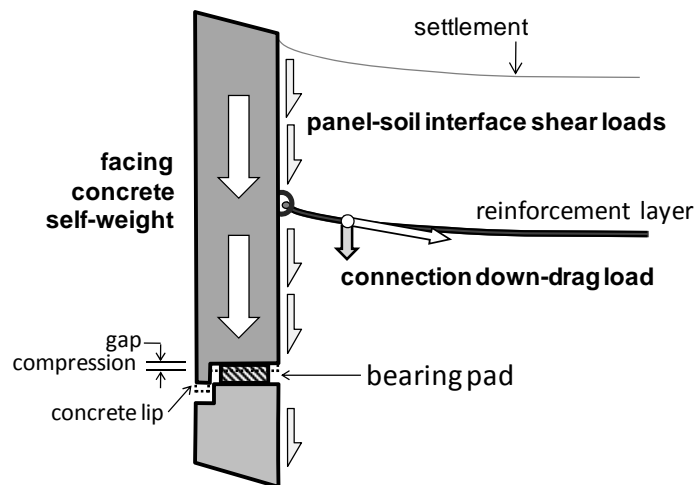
Vertical load in concrete panel wall face and gap compression. Note: Some panel systems have a lip at the back and front of the panel joint.
